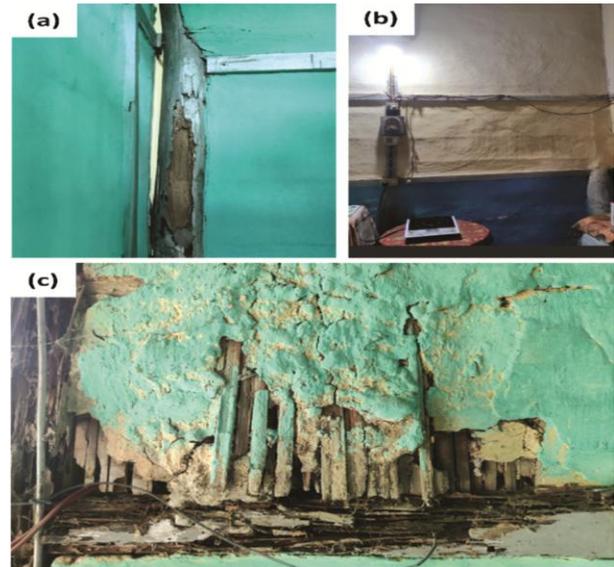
(a) Sal wood column (b) interior wattle and daub wall (c) exposed part of wall
